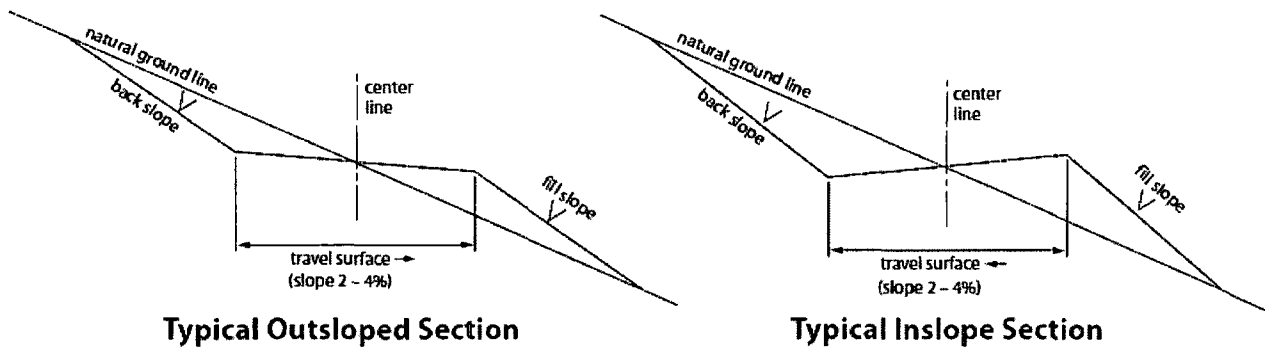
Cross-sections and plans for typical road sections representative of BLM resource or FS local and higher-class roads.
